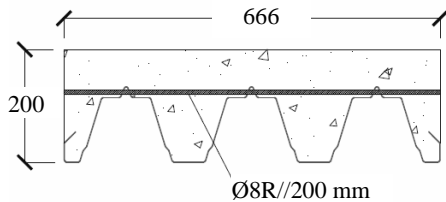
Experimental layout – Group A (dimensions in mm)
